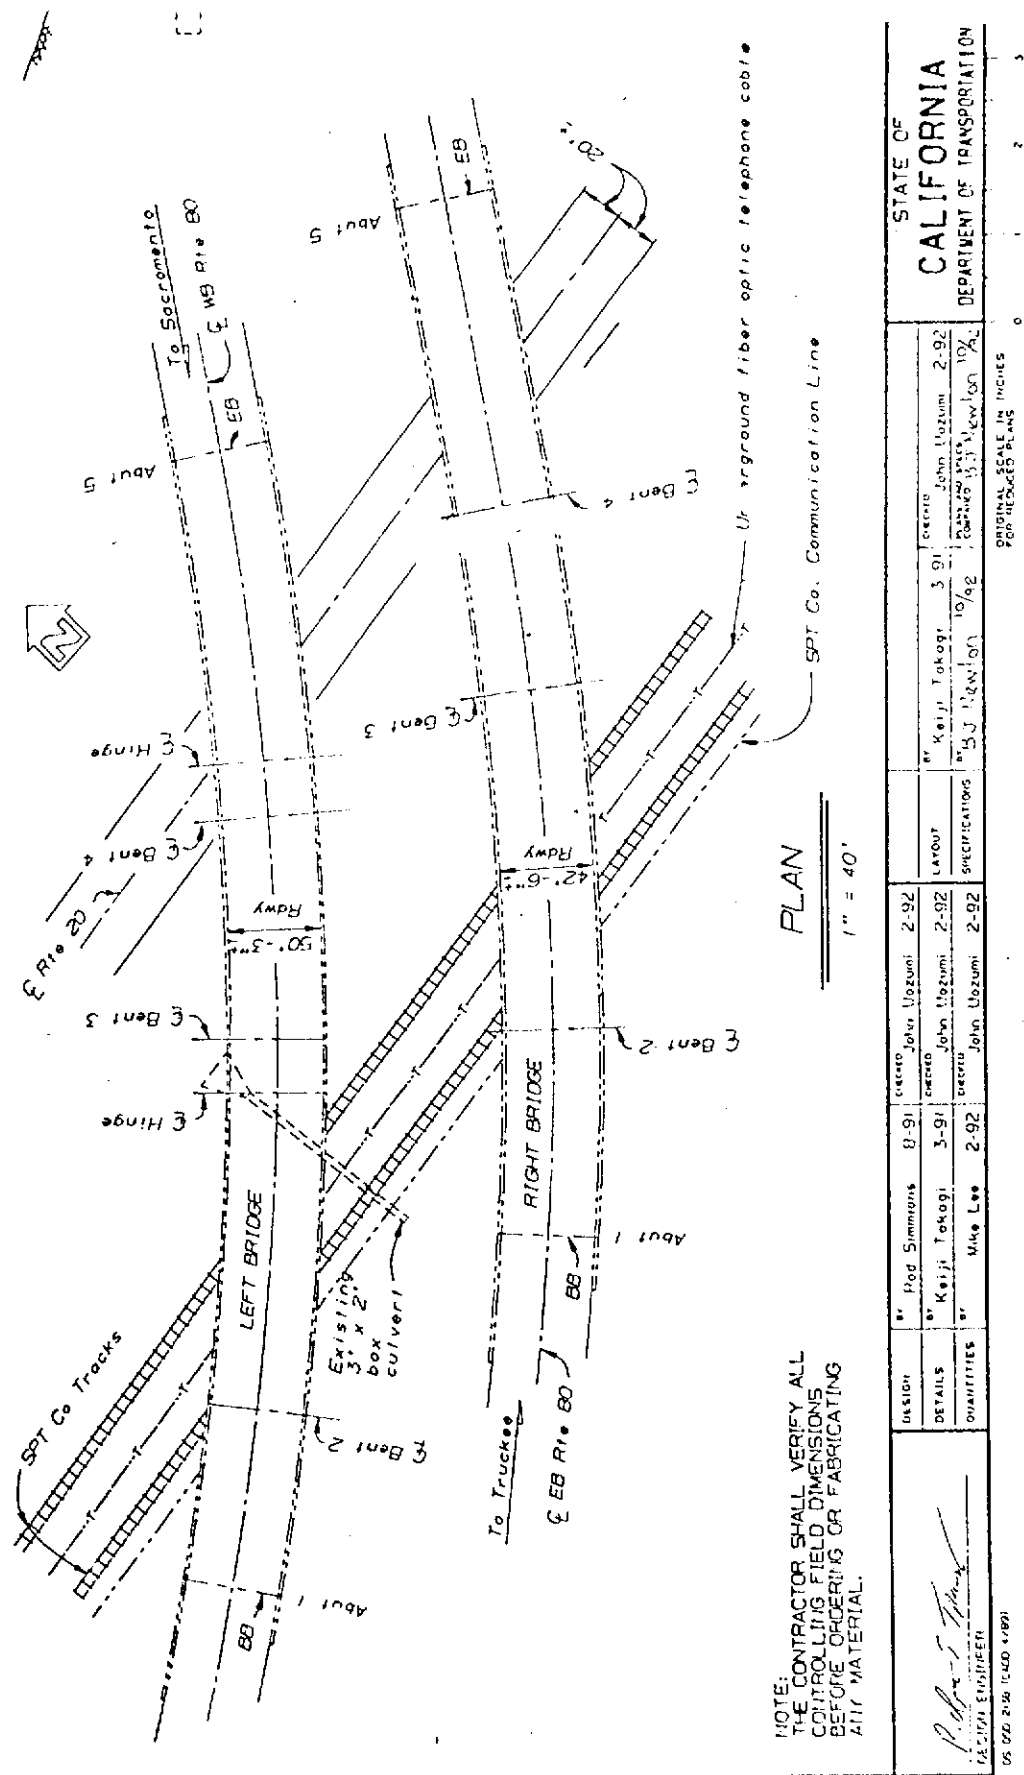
Plan view of Yuba Pass Overhead and Separation (Bridges 17-23 L/R).
